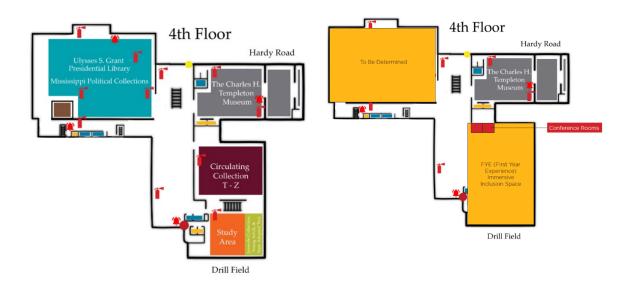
Initial and Planned Floor Plans for the Fourth Floor
